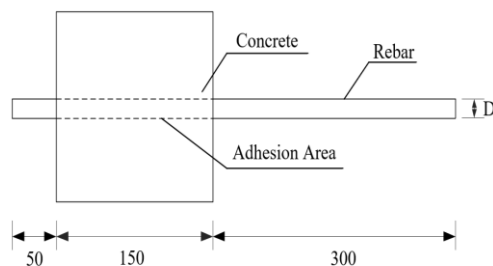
Detailed drawing of the specimen (unit: mm) D - steel bar diameter
